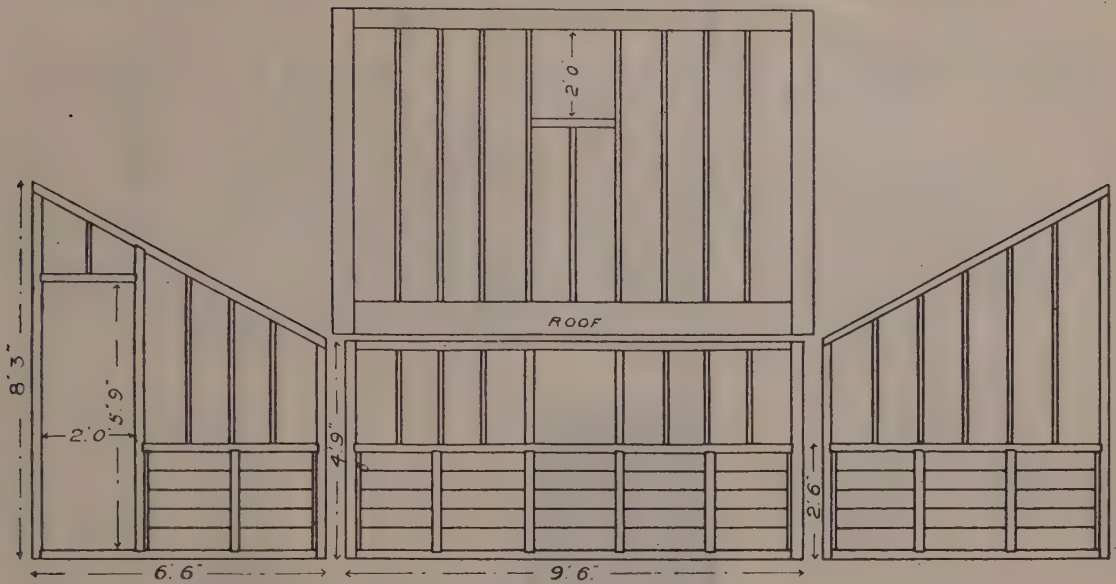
DOOR FRAME, FRONT FRAME, END FRAME AND ROOF FRAME, WITH SIZES.
